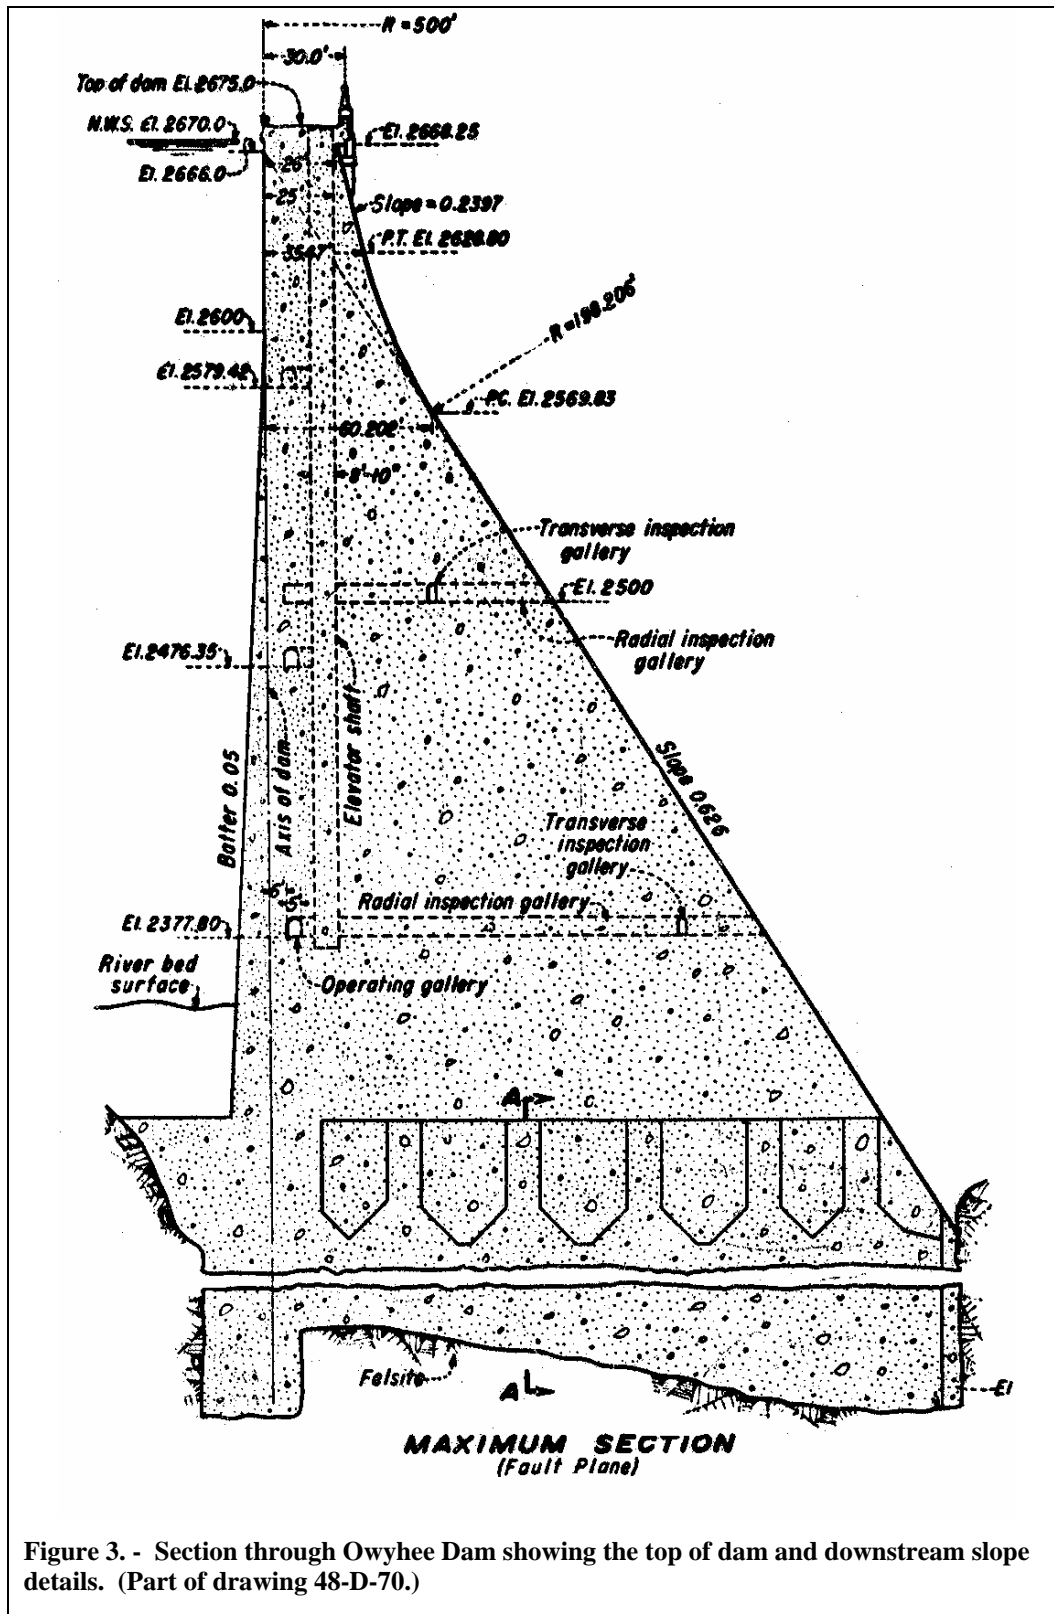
Section through Owyhee Dam showing the top of dam and downstream slope details. (Part of drawing 48-D-70.)
